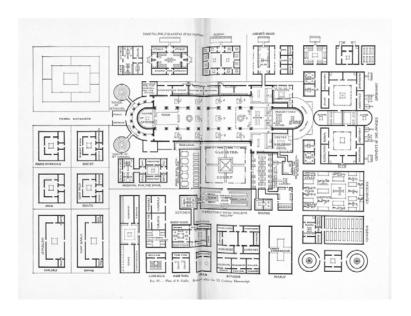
Proposed Plan of St. Gall, Switzerland (Source: flicker, Penn State University Libraries Architecture and Landscape Architecture)
